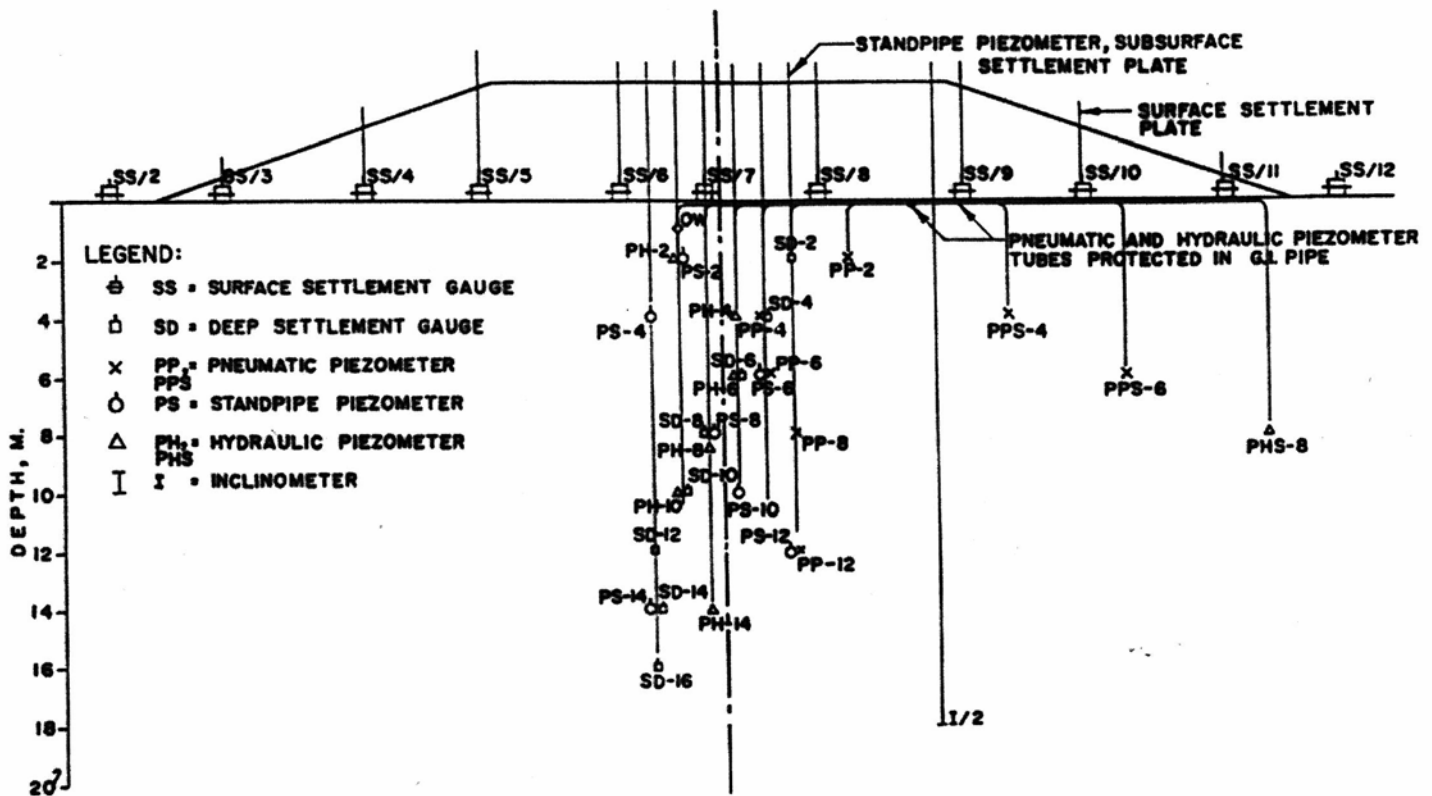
Section view of the test embankment showing the position of instruments at the Second Bangkok International Airport (SBIA)
